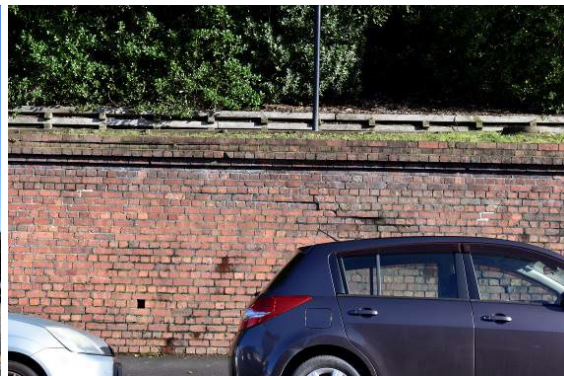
Looking west at a section of the heritage brick wall on Tasman Street.
